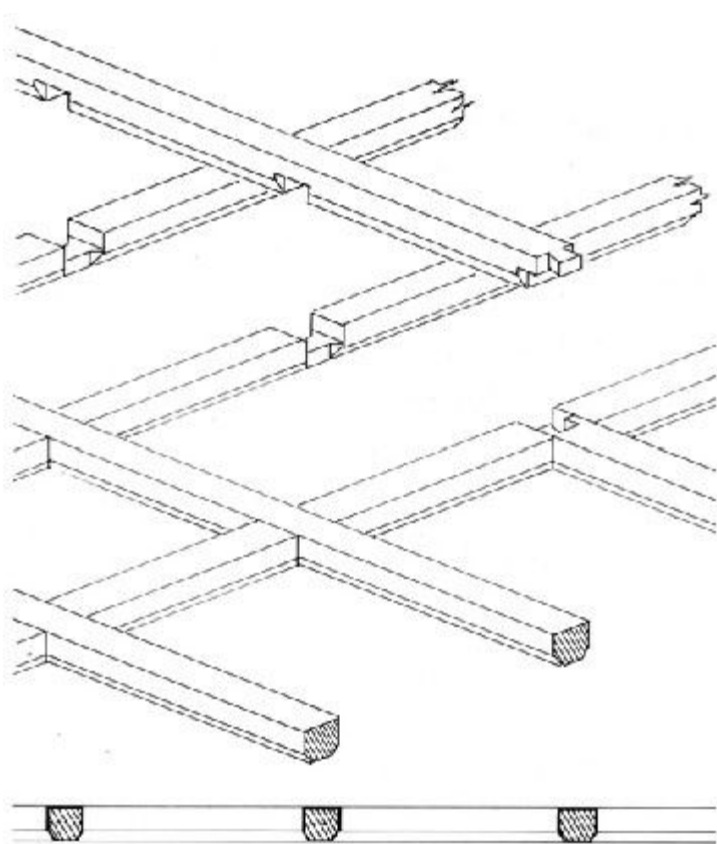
The ceiling is a grid of wooden members (approximately 10 cm square in section), which are jointed at every intersection.
